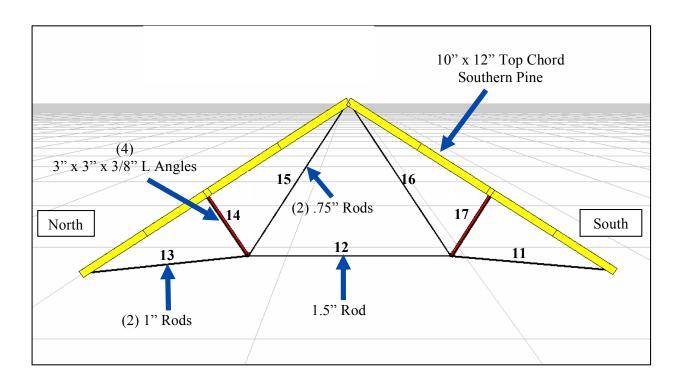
Layout of principal truss used throughout most of the Breeding Barn
